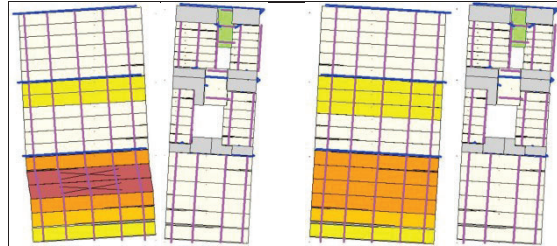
Structural damage on unreinforced walls w2(S), and w4(N) from pushover in w3 direction
